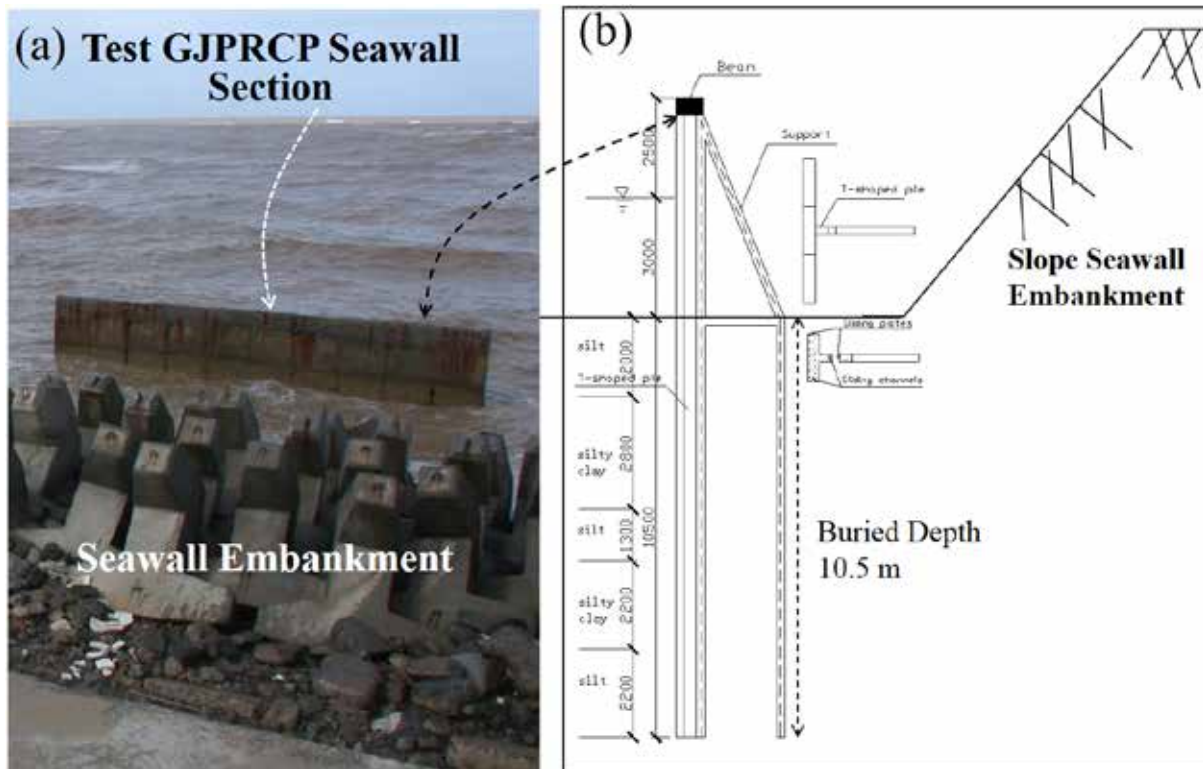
Design details of a test section of a grout jetted precast reinforced concrete pile seawall in front of a main seawall embankment
